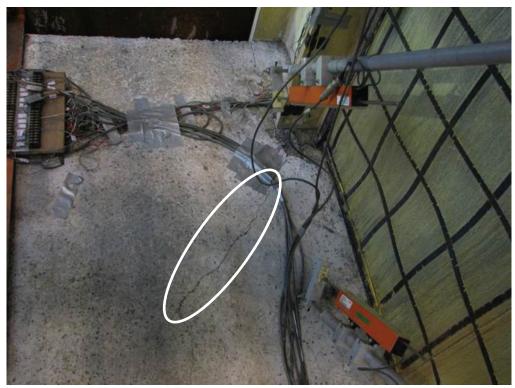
Cracks in the Intermediate Slab
